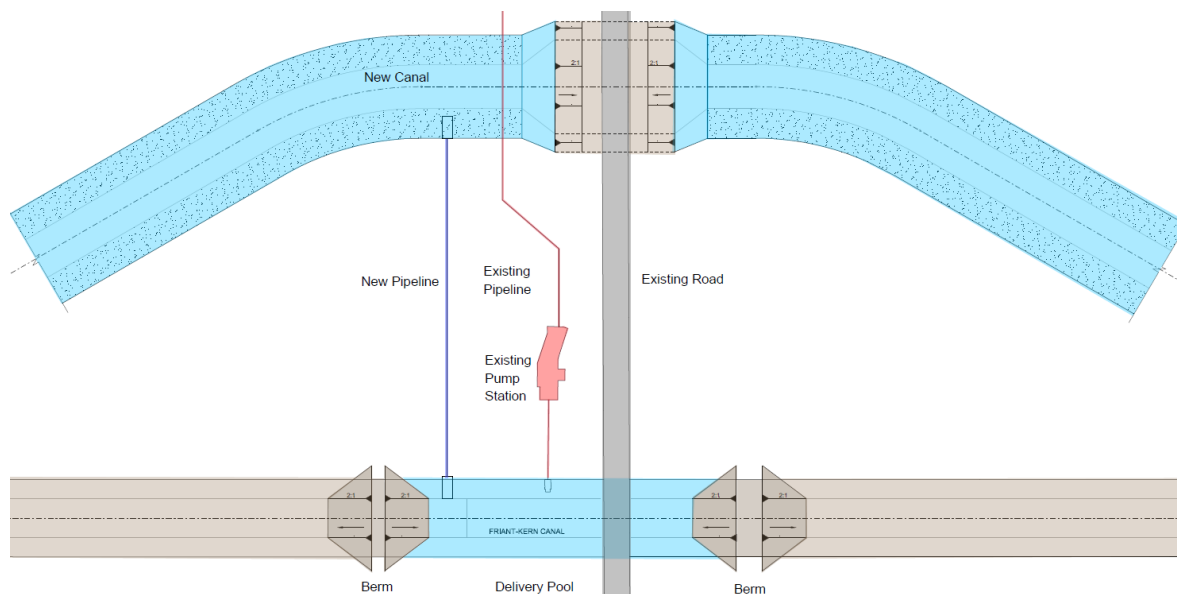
Example Pressurized System Turnout Design in the Recommended Plan
